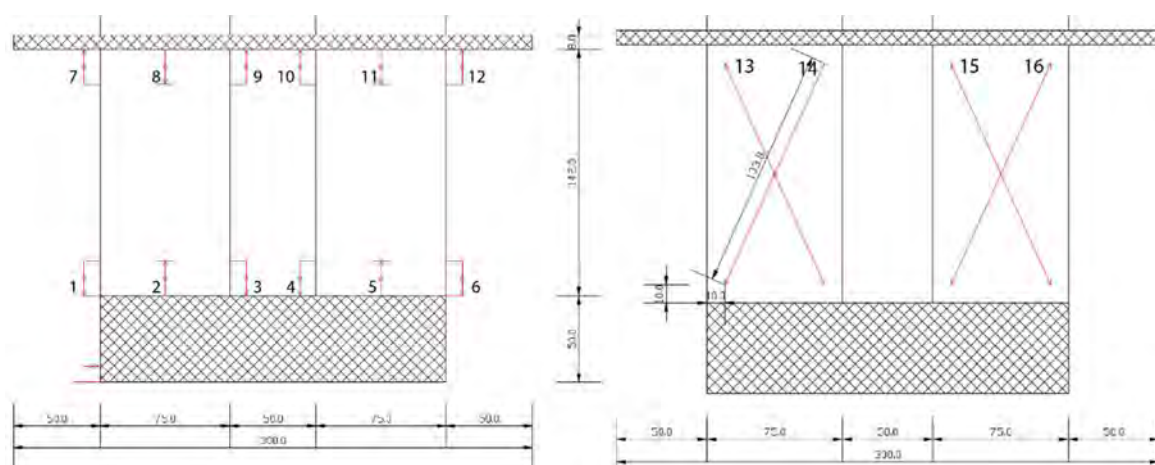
LVDTs 1st floor (1/2) (left) and LVDTs 1st floor (2/2) (right)
